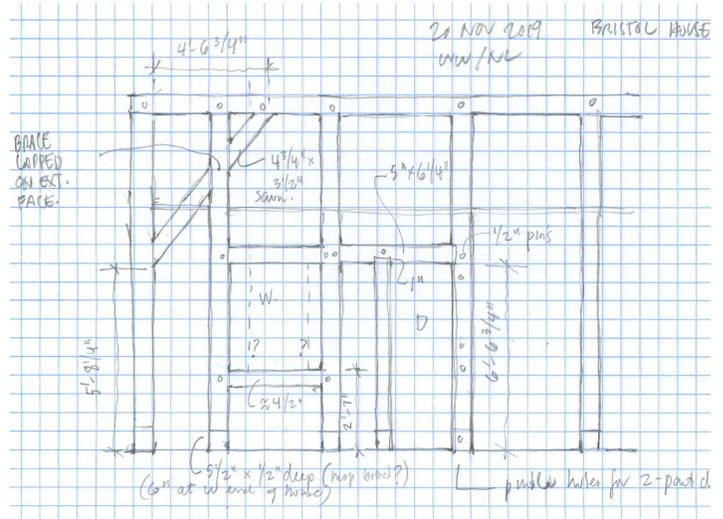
Drawing of framing for door and window on east side of south wall (see Fig. 4). Drawing by Walter R. Wheeler & Neil Larson, 2019.
